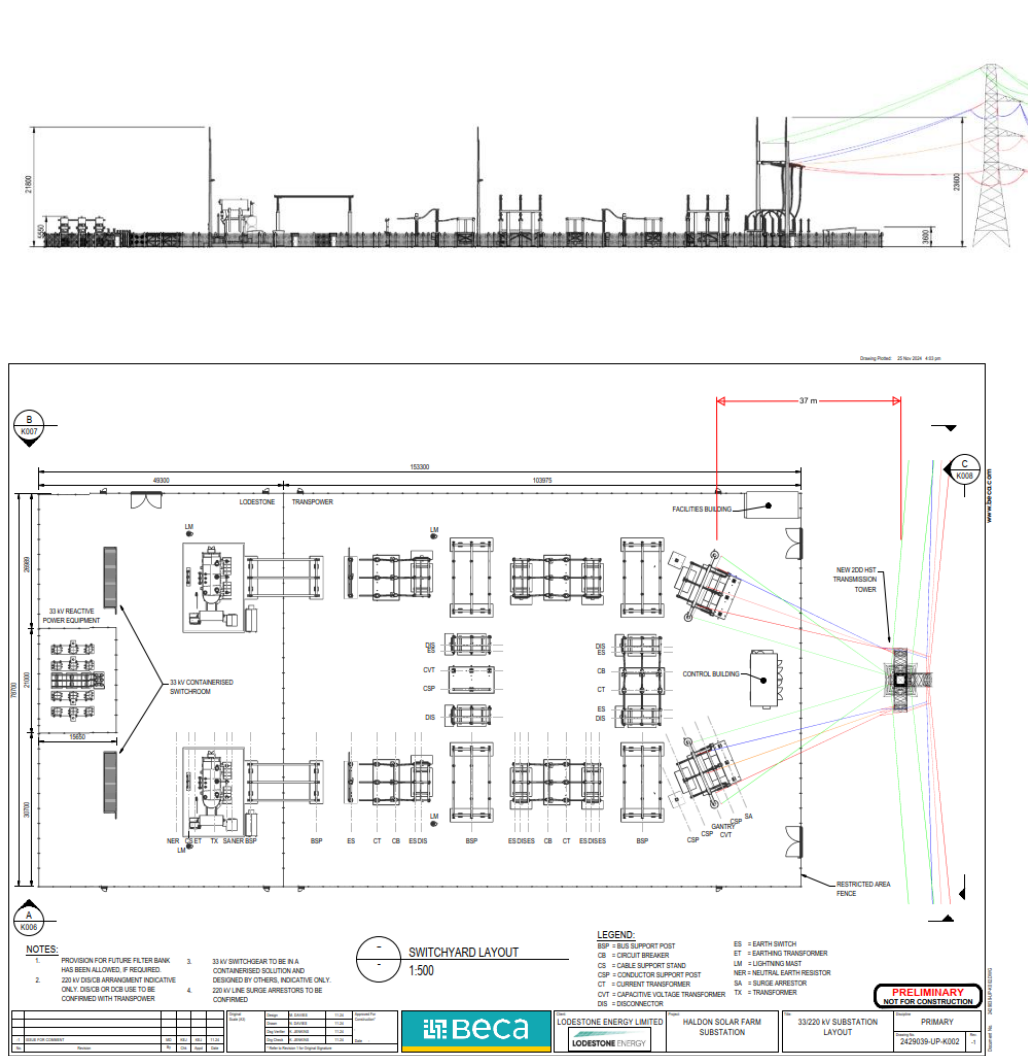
Design (profile and plan views) of the substation, high voltage tower and connecting transmission lines.
